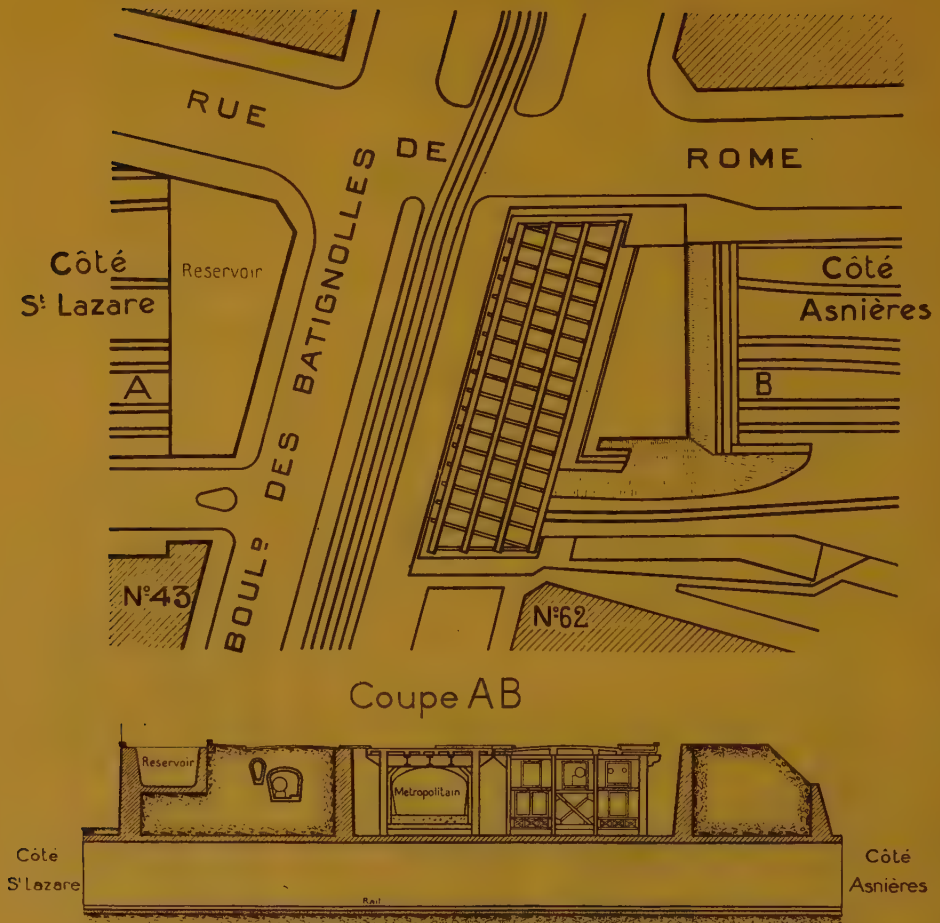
Batignolles bridge. — Construction of second bridge (Asnières side).
